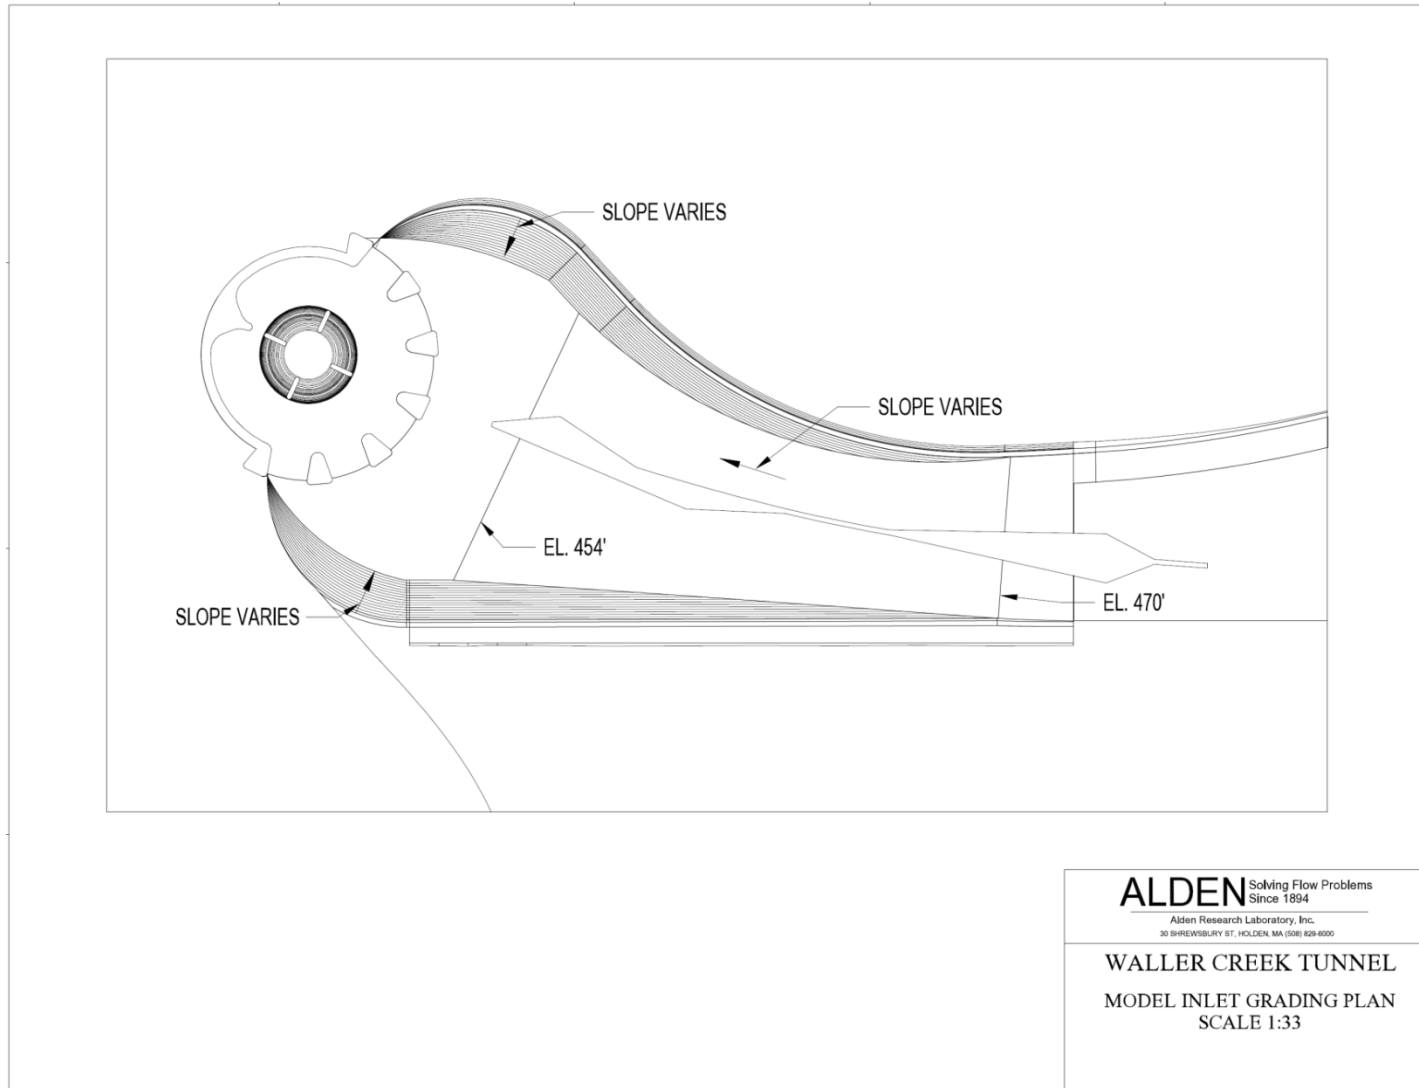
Waller Creek Tunnel Project; 1:33 Scale Model – Inlet Pool Grading Plan
